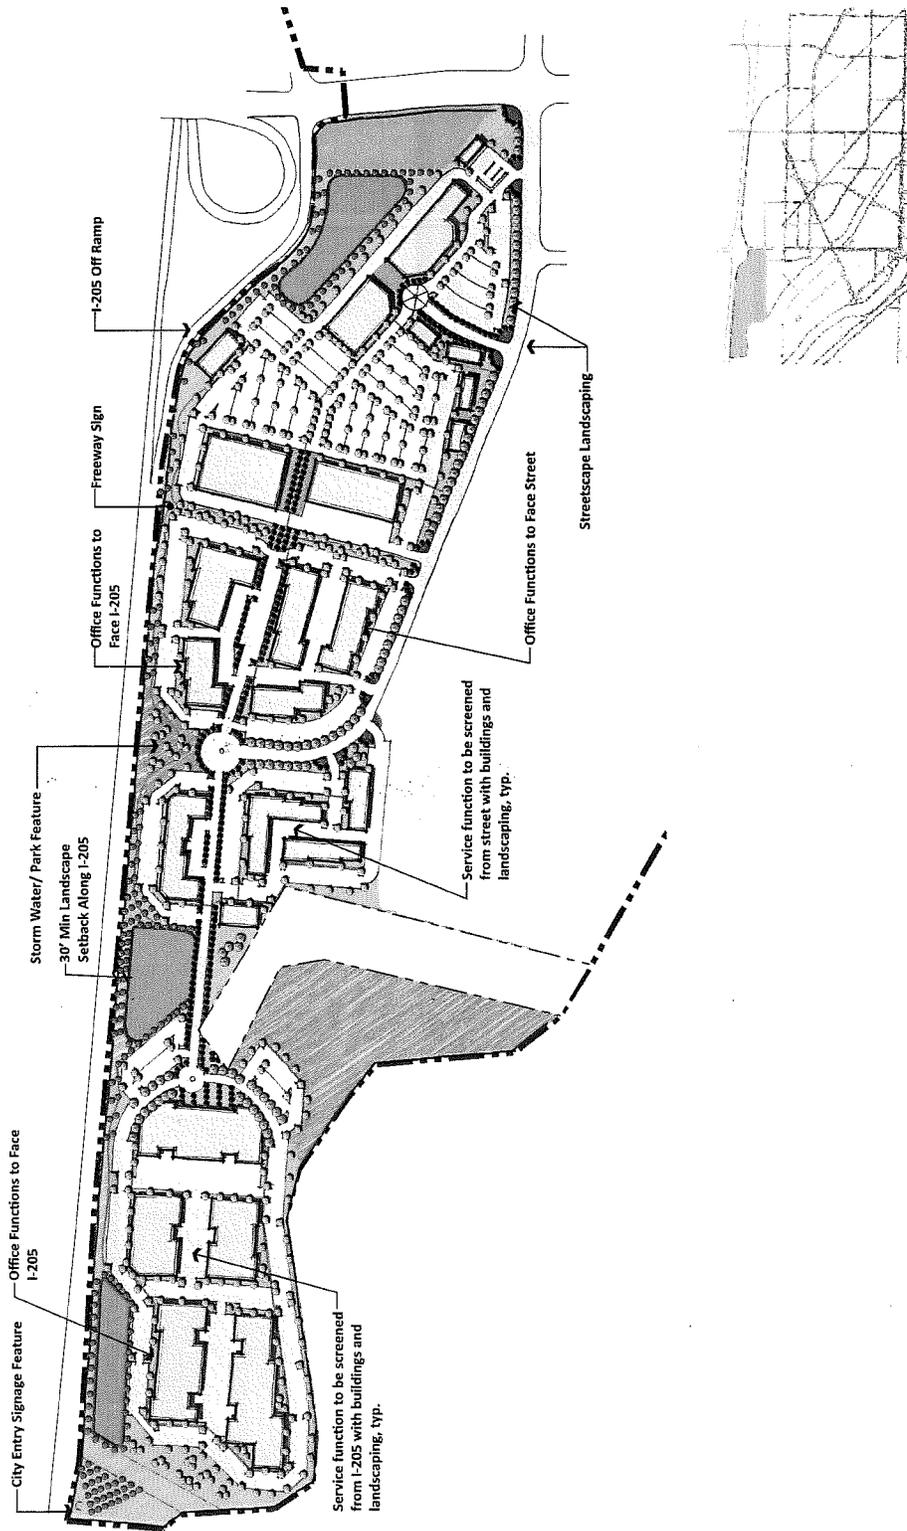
, I-205 Overlay Zone Illustrative Plan - West of Mountain House Parkway
